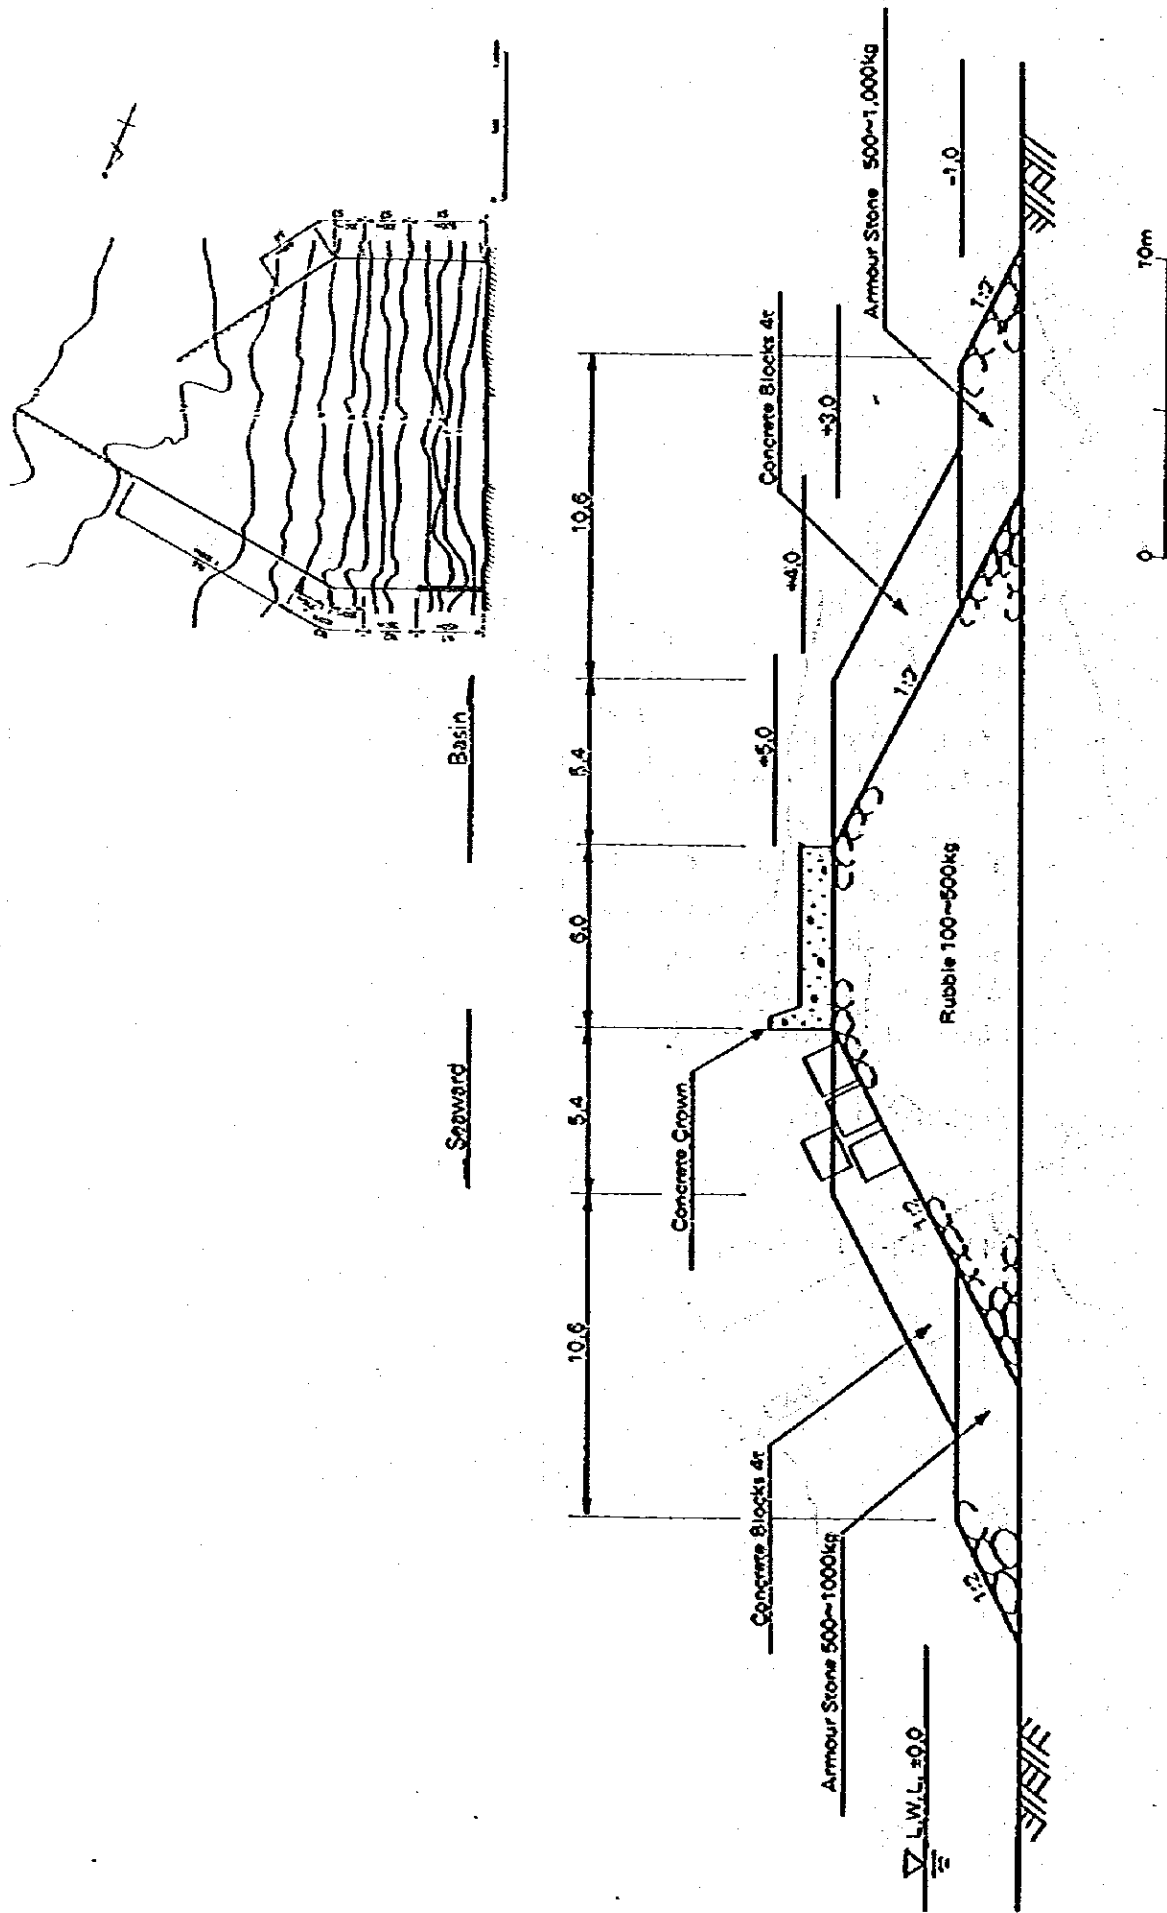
(2) Standard Connection of Breakwater (N1 Section)
